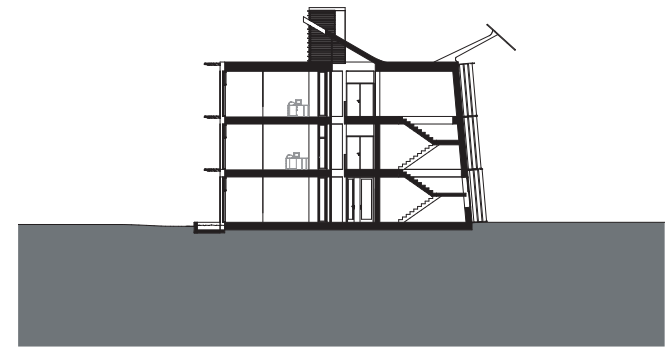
North elevation of the New Generation Office Building (Scale 1:500)
